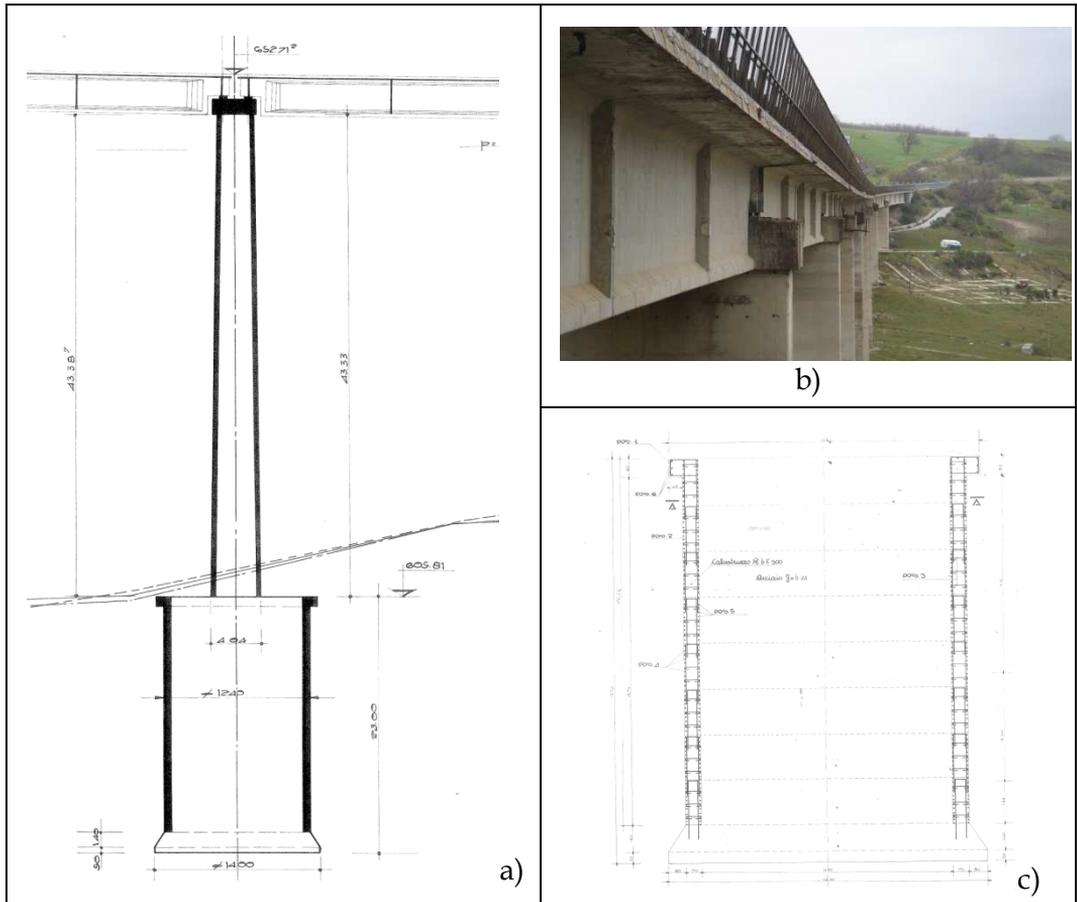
Examples of viaduct with caissons foundations. a) Longitudinal pier section; b) Picture of viaduct; c) Transversal section of caisson. Dimensions are in meters
